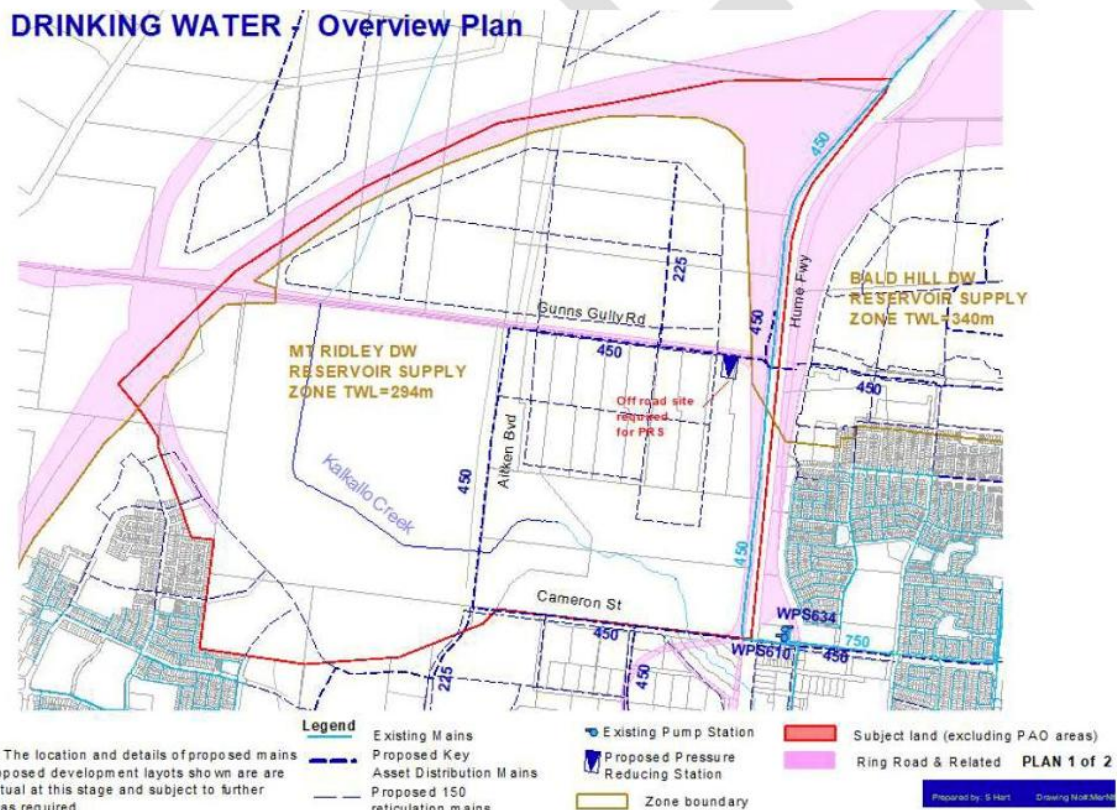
YVW Drinking Water Concept Plan (Source: Utility Servicing Assessment 2026, SMEC)
